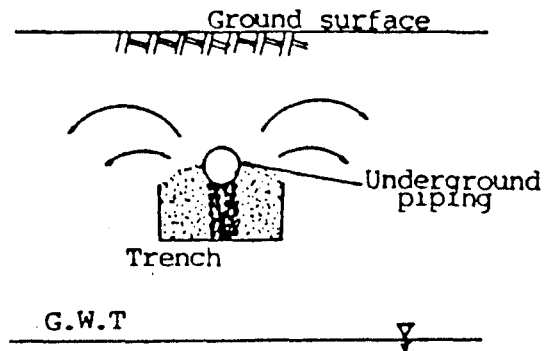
A typical cross section of artificial recharge by underground piping
